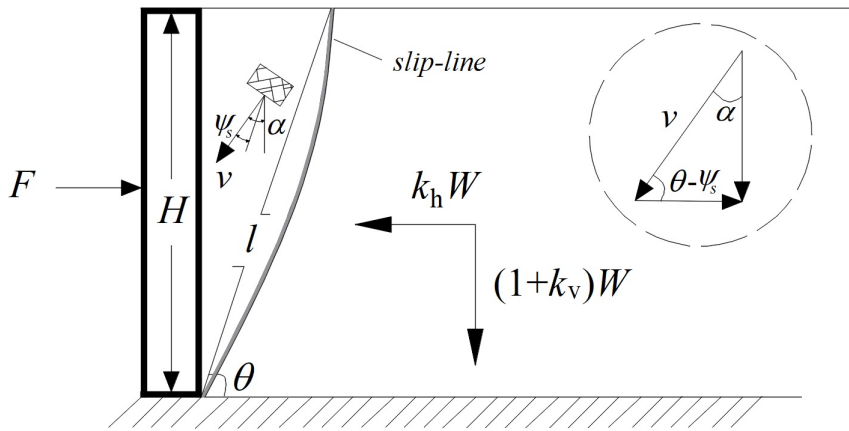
Non-linear active failure mechanism: pseudo-static analysis of retaining walls.
